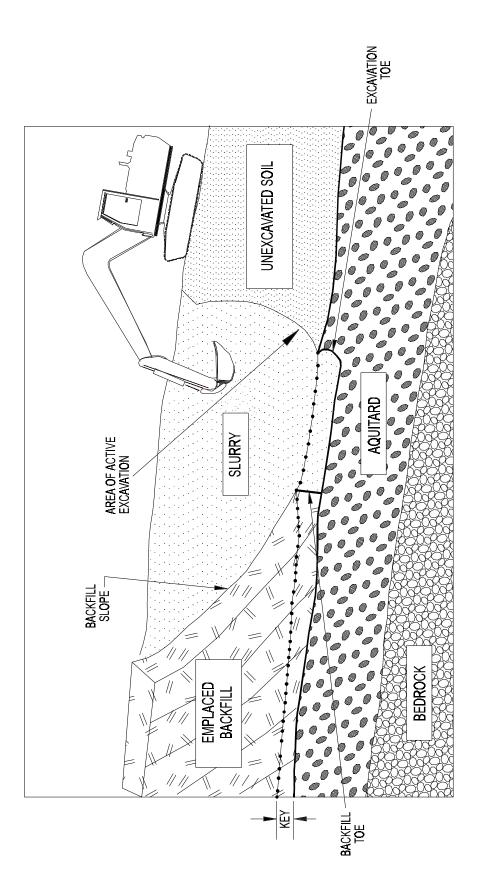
SOIL-BENTONITE SLURRY TRENCH CROSS-SECTION
